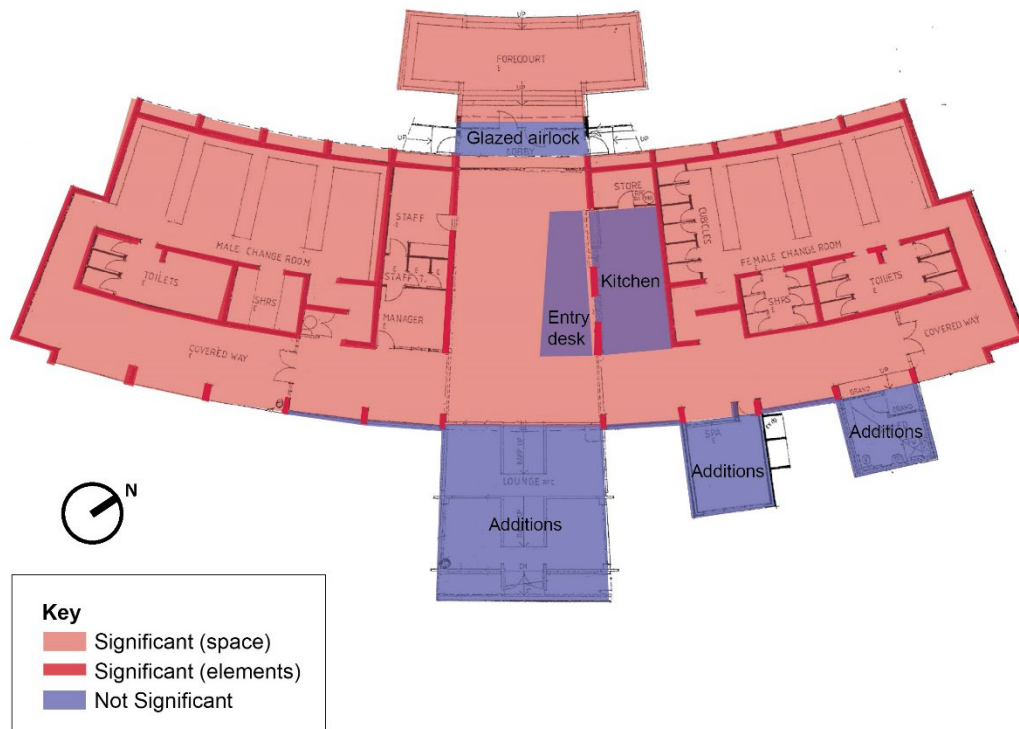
Diagram of 1968 facilities building indicating significant and not significant spaces and elements.
